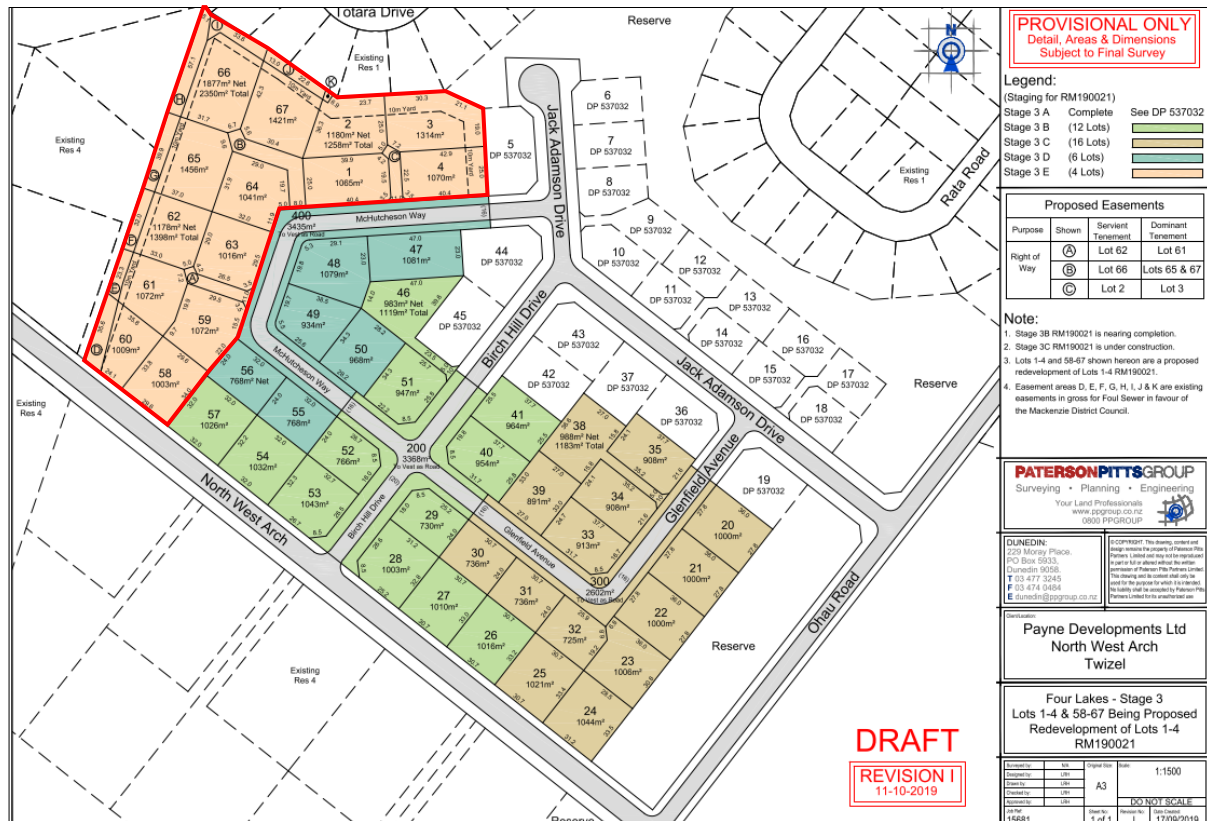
Subdivision Scheme Plan. Stage 3E is outlined in red.
